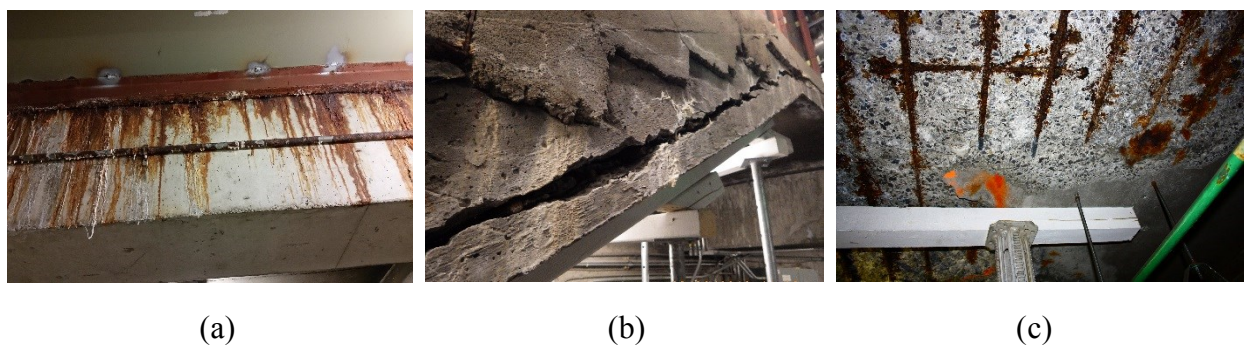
Concrete Degradation in Different Montréal Metro Stations (a) Water Overflow and Moisture Marks; (b) Wide Cracks in Stairs Structure; (c) Corrosion and Delamination in Concrete Floor Slab
